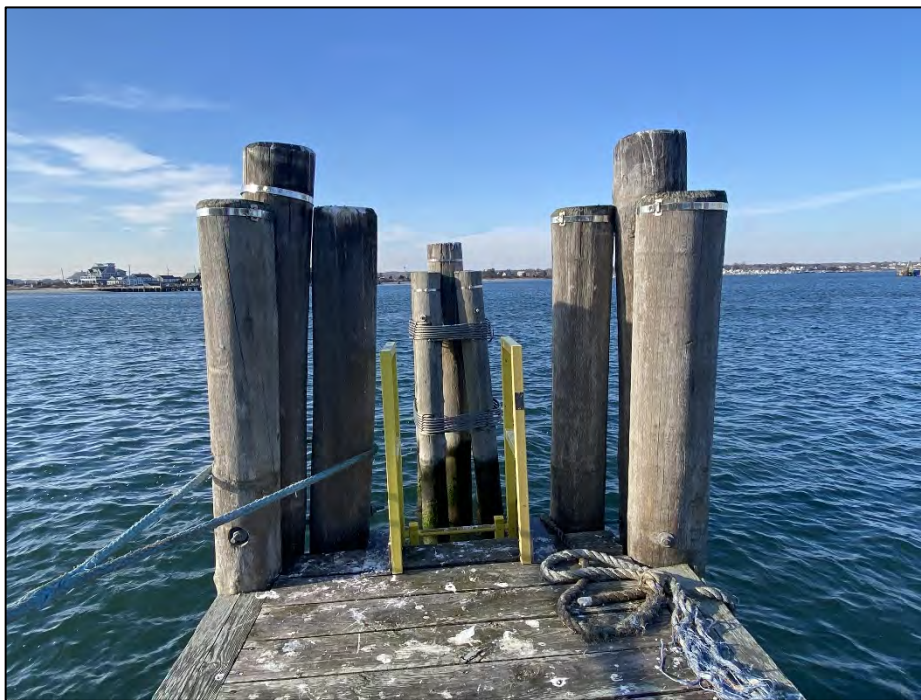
Typical deterioration of the dolphin adjacent to Pier "G".
